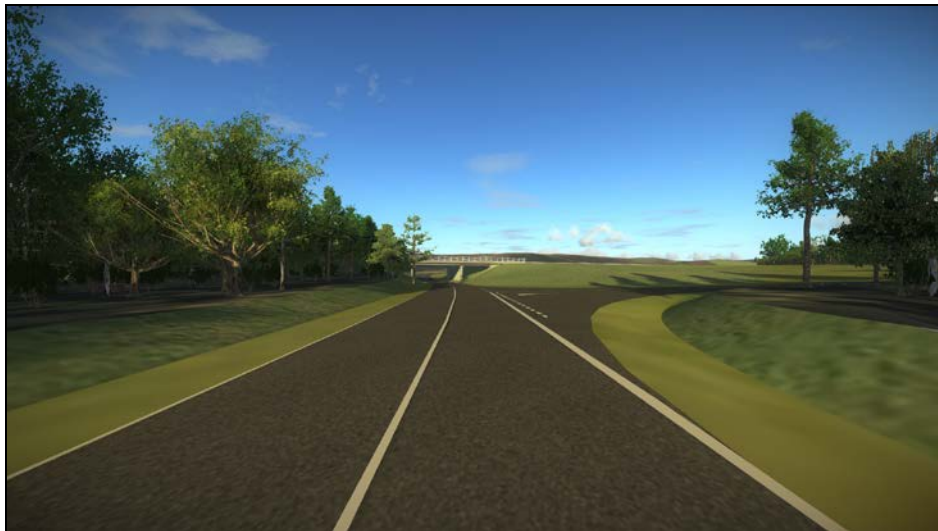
Indicative view towards Newtonmore Junction and underbridge from link road
